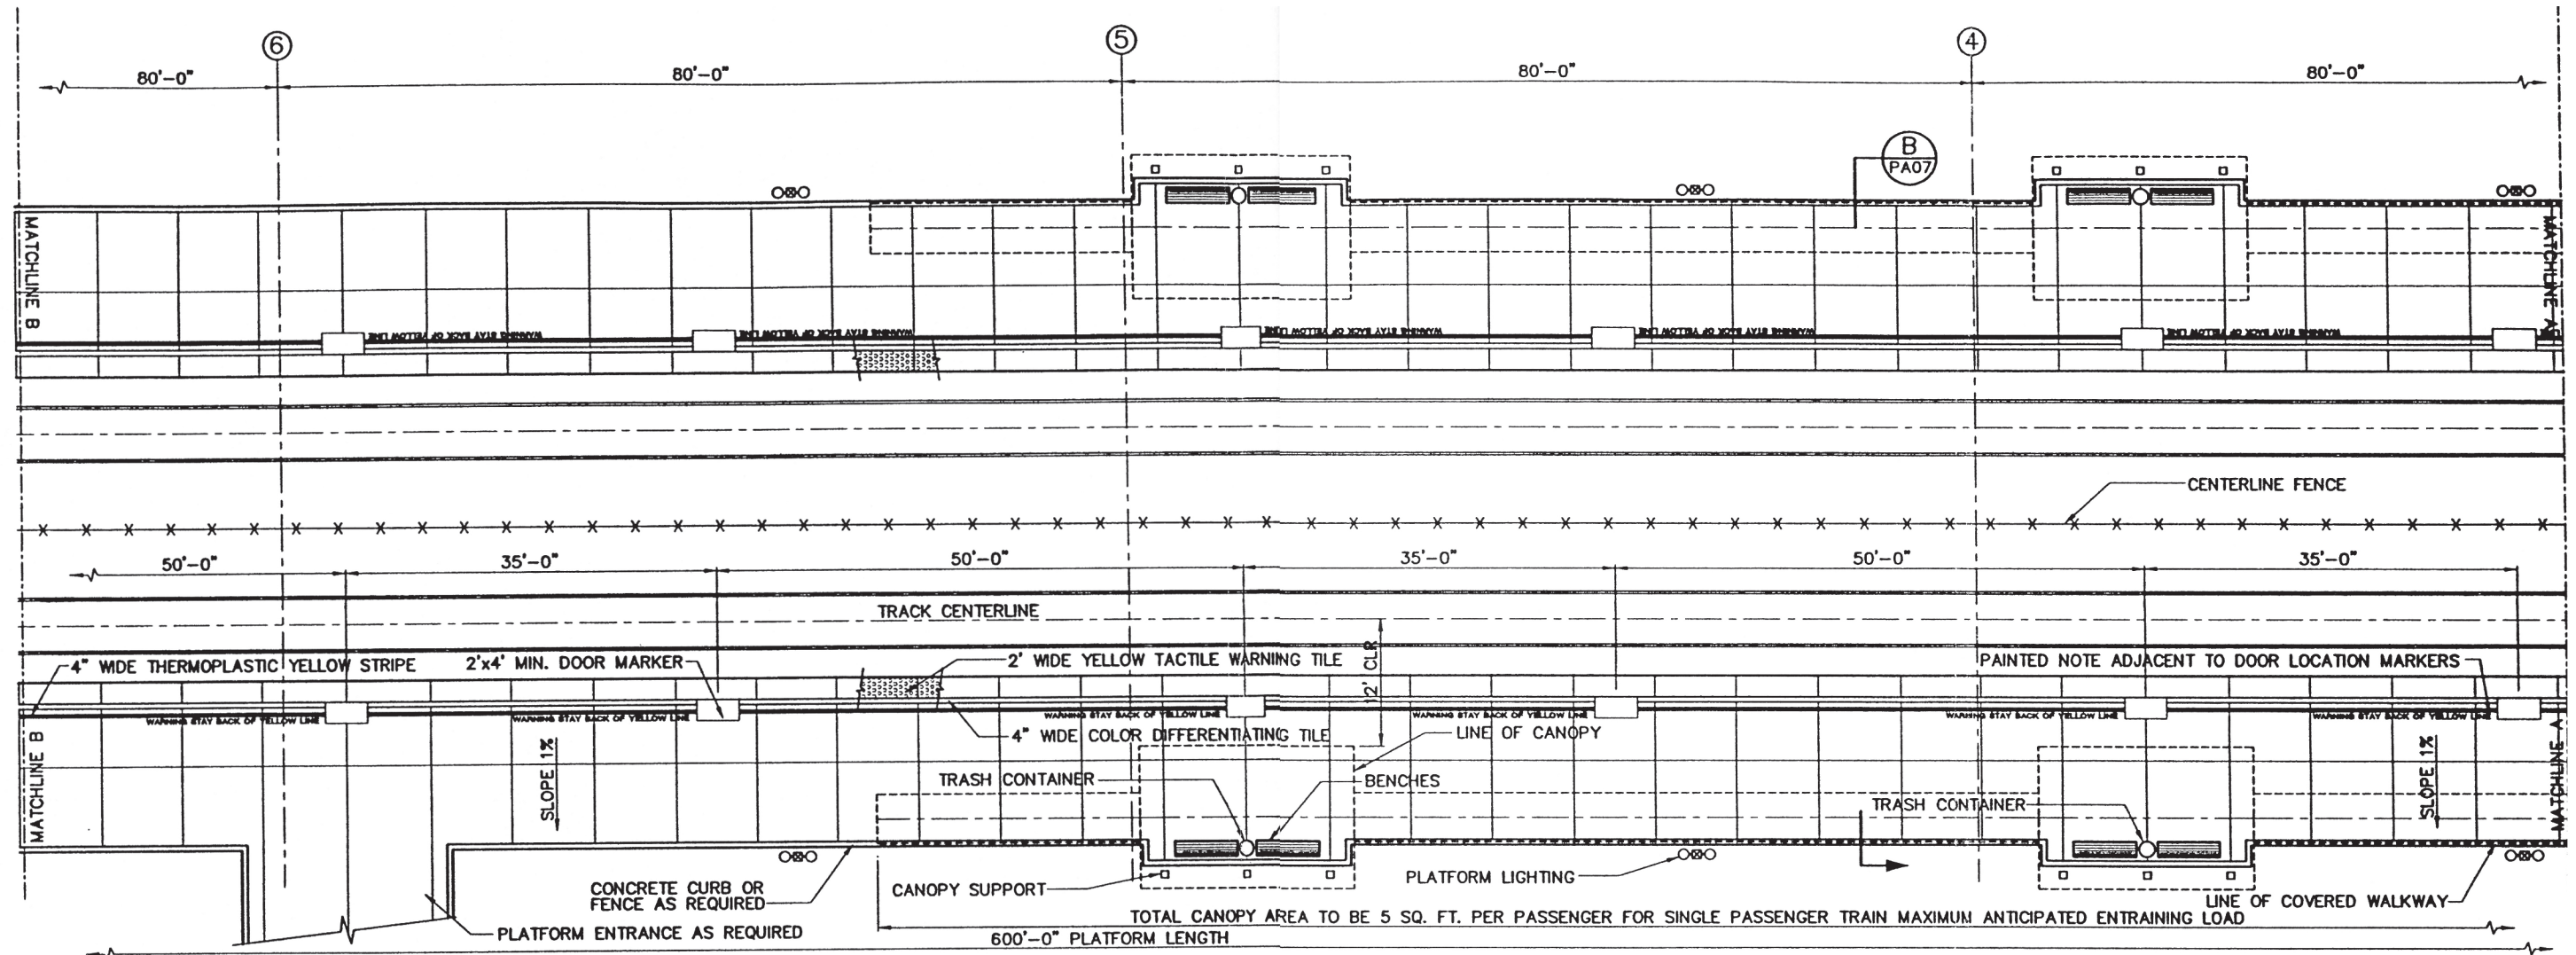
Sample Sounder Station Plan - Double Side Platform (Sheet 1 of 3)
